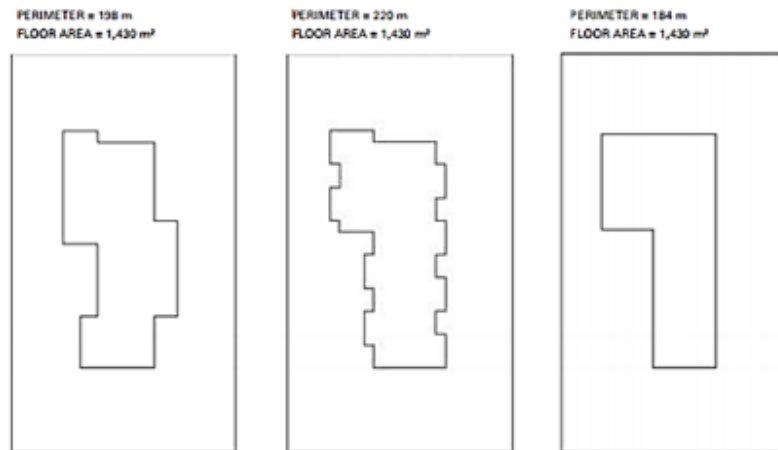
Comparison of building footprints with the same floor area. Building perimeter in the center is substantially more and leading to increased surface area and higher solar gain (Building and Construction Authority, 2010).
